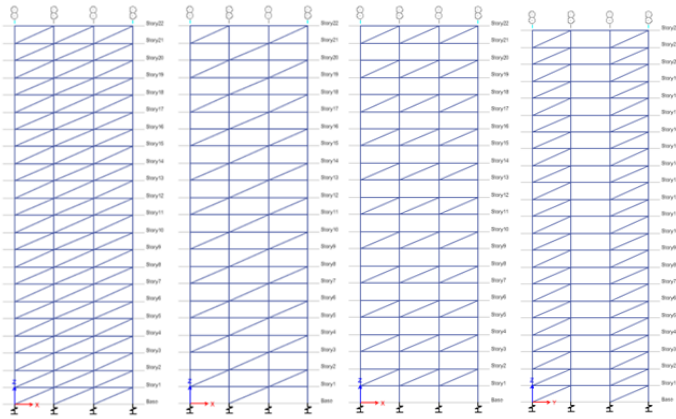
ELEVATION OF 22 STOREY DIAGRID BUILDINGS WITH ECCEN FORWARD BRAC-ING PATTERN ARRANGEMENT ((A) WHOLE, (B) ALTERNATE, (C) HORIZONTAL, (D) VERTICAL)
